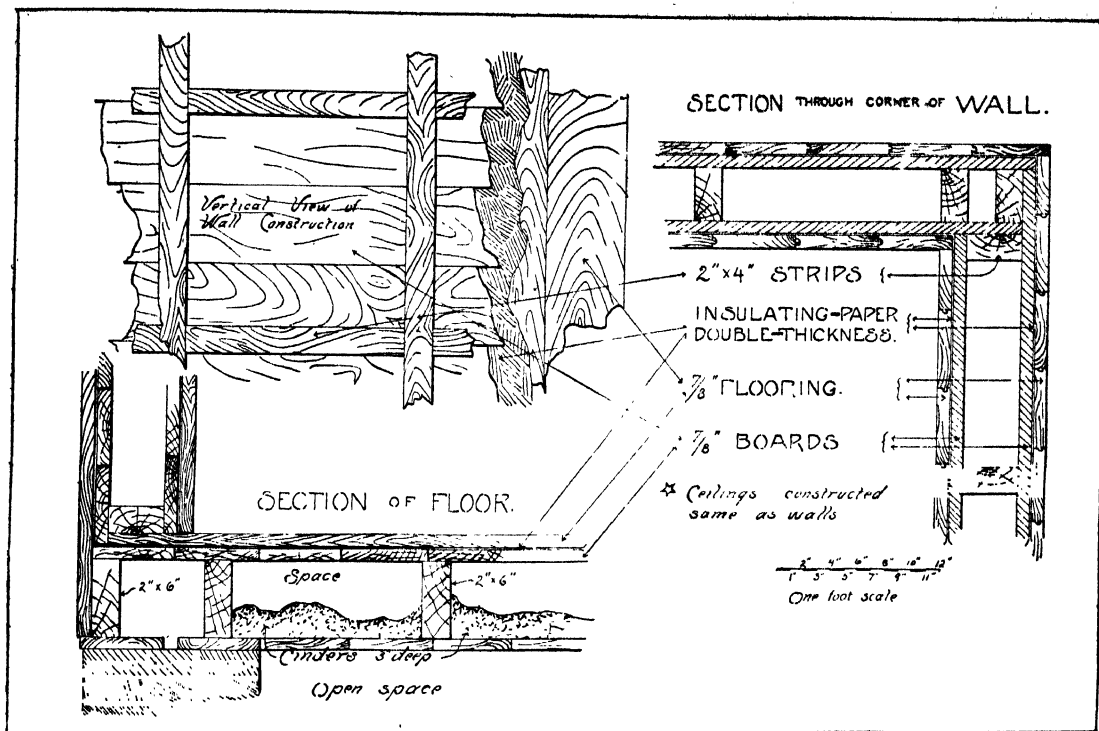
Sections of wall and floor of the average creamery refrigerator.
